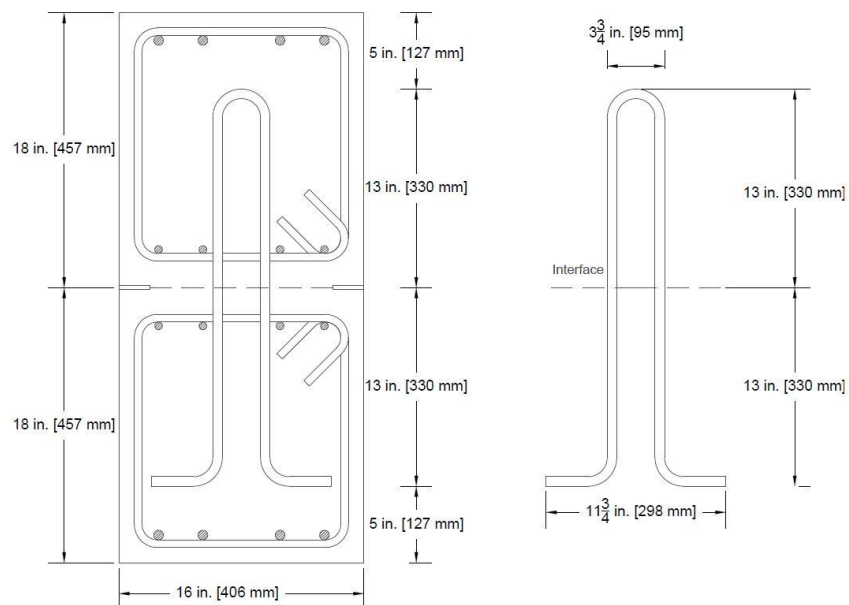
Section B-B steel layout for a specimen containing three #4 U-bars spaced at 6 in. (152 mm).
